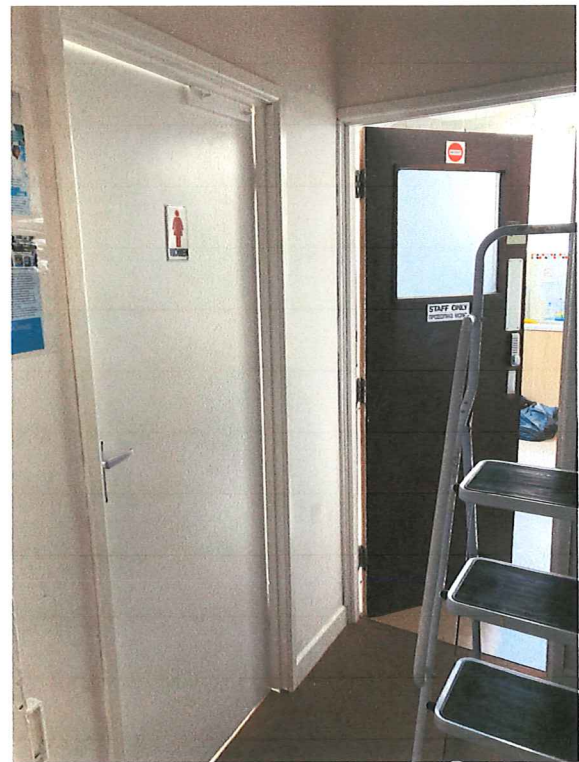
Door D.6. (modern paint ply) in background. Fig 18 - Doors D.7 and D.8, both modern (Door D.4. is also a modern door similar to D.8. although it has eluded the camera).
